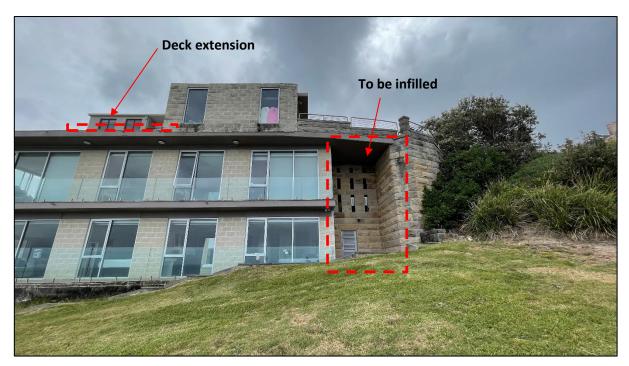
Site viewed from reserve looking west with location of proposed works outlined in red.
